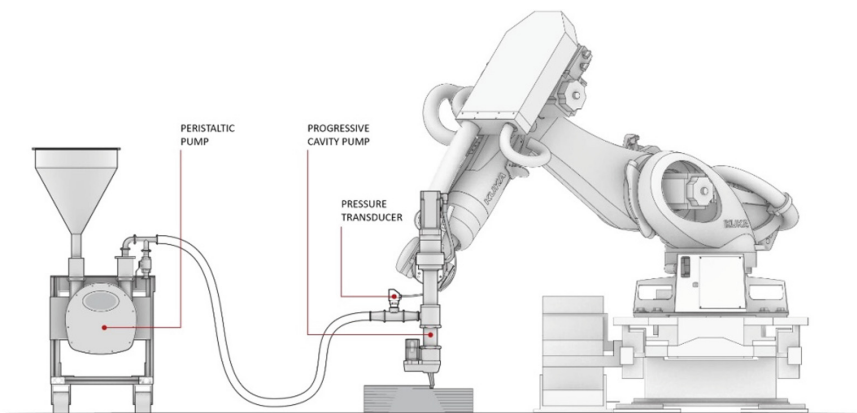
3DCP system consisting of supply pump and robotically positioned extrusion head.
